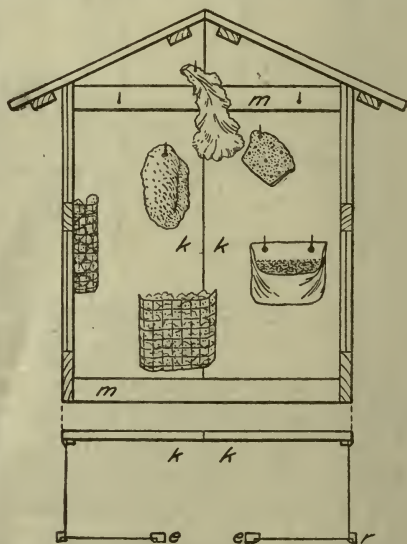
Vertical section, side to side, with suggestions for larder; diagrammatic and cross section of food shelter shown in figure 42.
